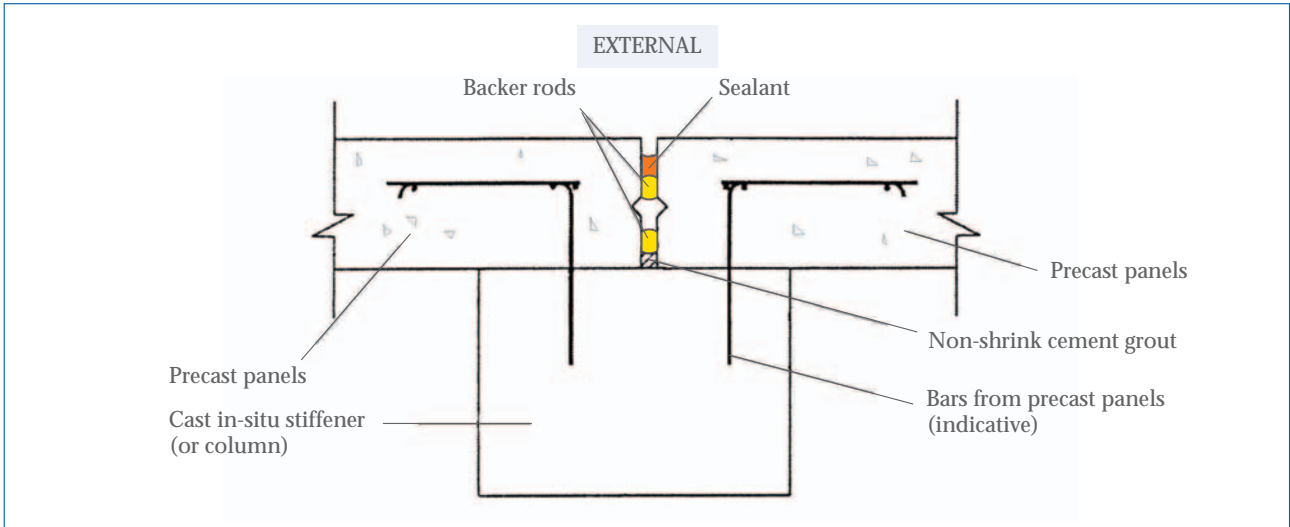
Typical details for wet joint between precast panels (plan view)
